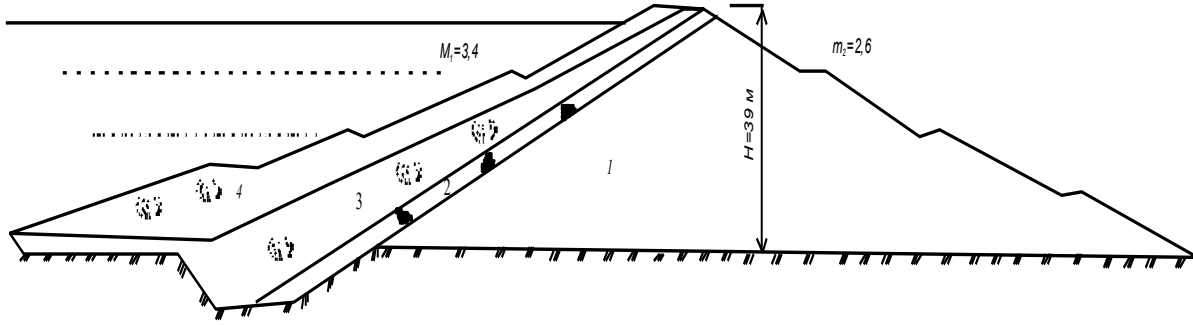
Earth dam: 1 – retaining prism; 2 – concrete transition zone; 3 – loamy diaphragm (a mixture of loam and sandy loam); 4 – upstream wedge of gravel-pebble soil with sand filling
